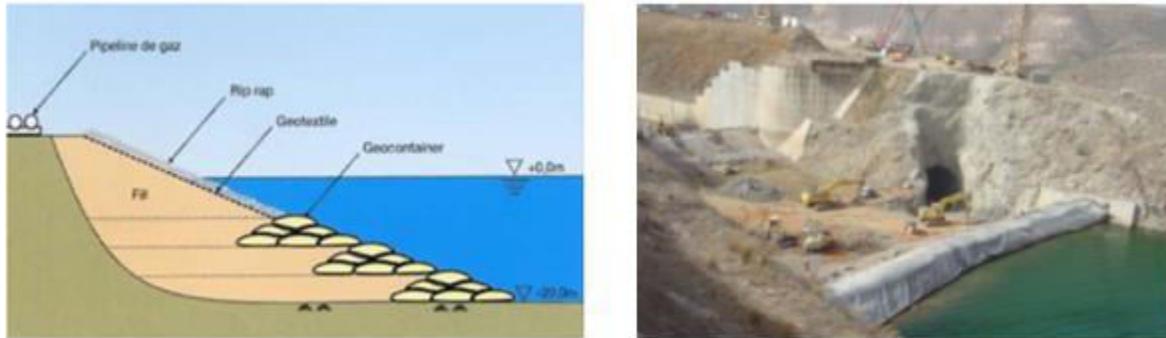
The left picture shows the placement of geotubes and the right shows the dry works space (Koffler, Choura, Bendriss, & Zengerink, 2008)
